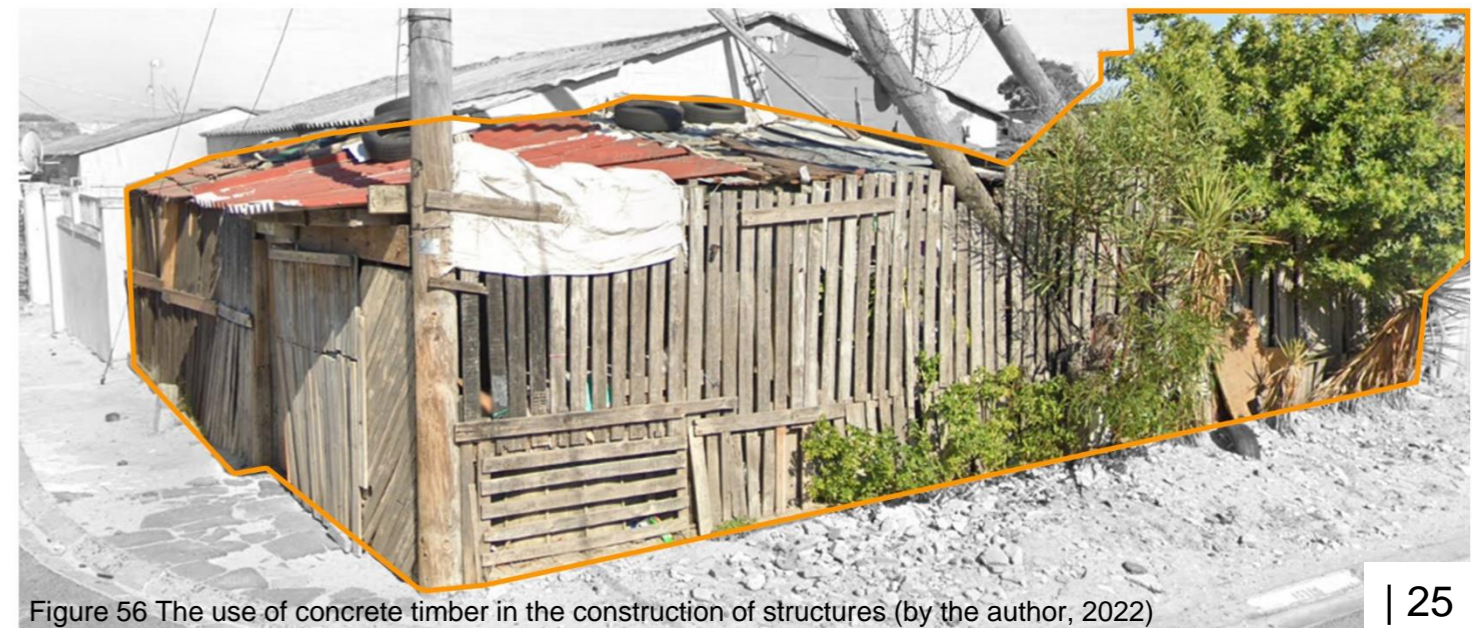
The use of concrete timber in the construction of structures (by the author, 2022)
